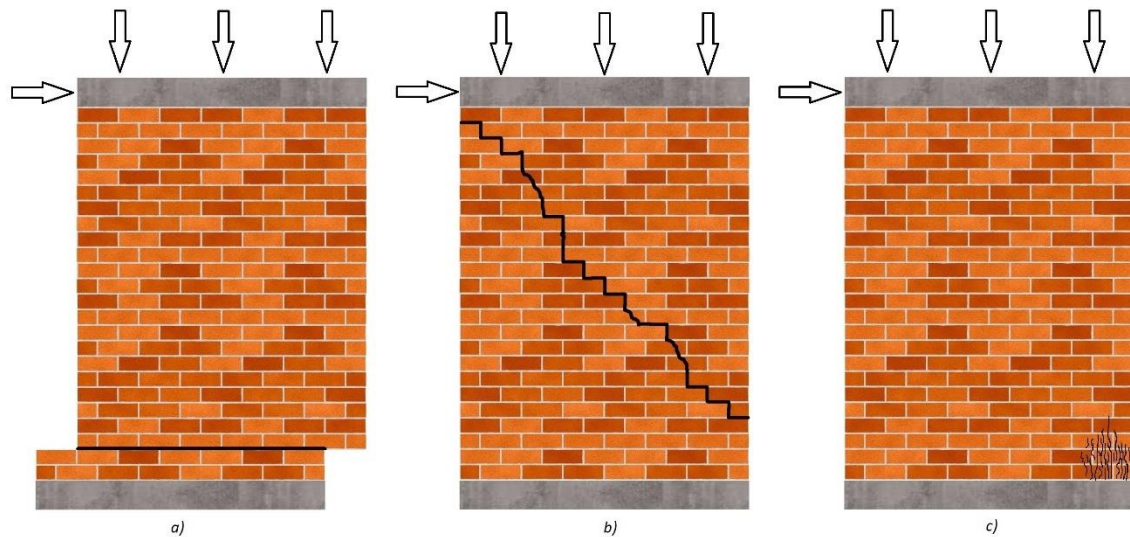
Common failures in masonry walls, a) Slip failure b) Cutting failure c) Bending failure (Figure by authors)
